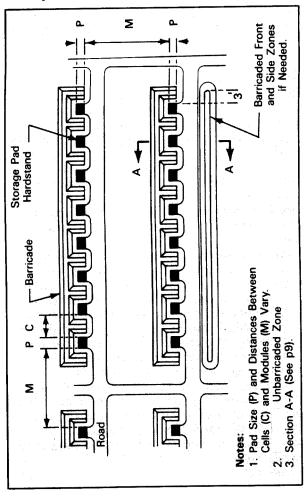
Aerial View of a Typical 8-Cell Module Storage Plan.
